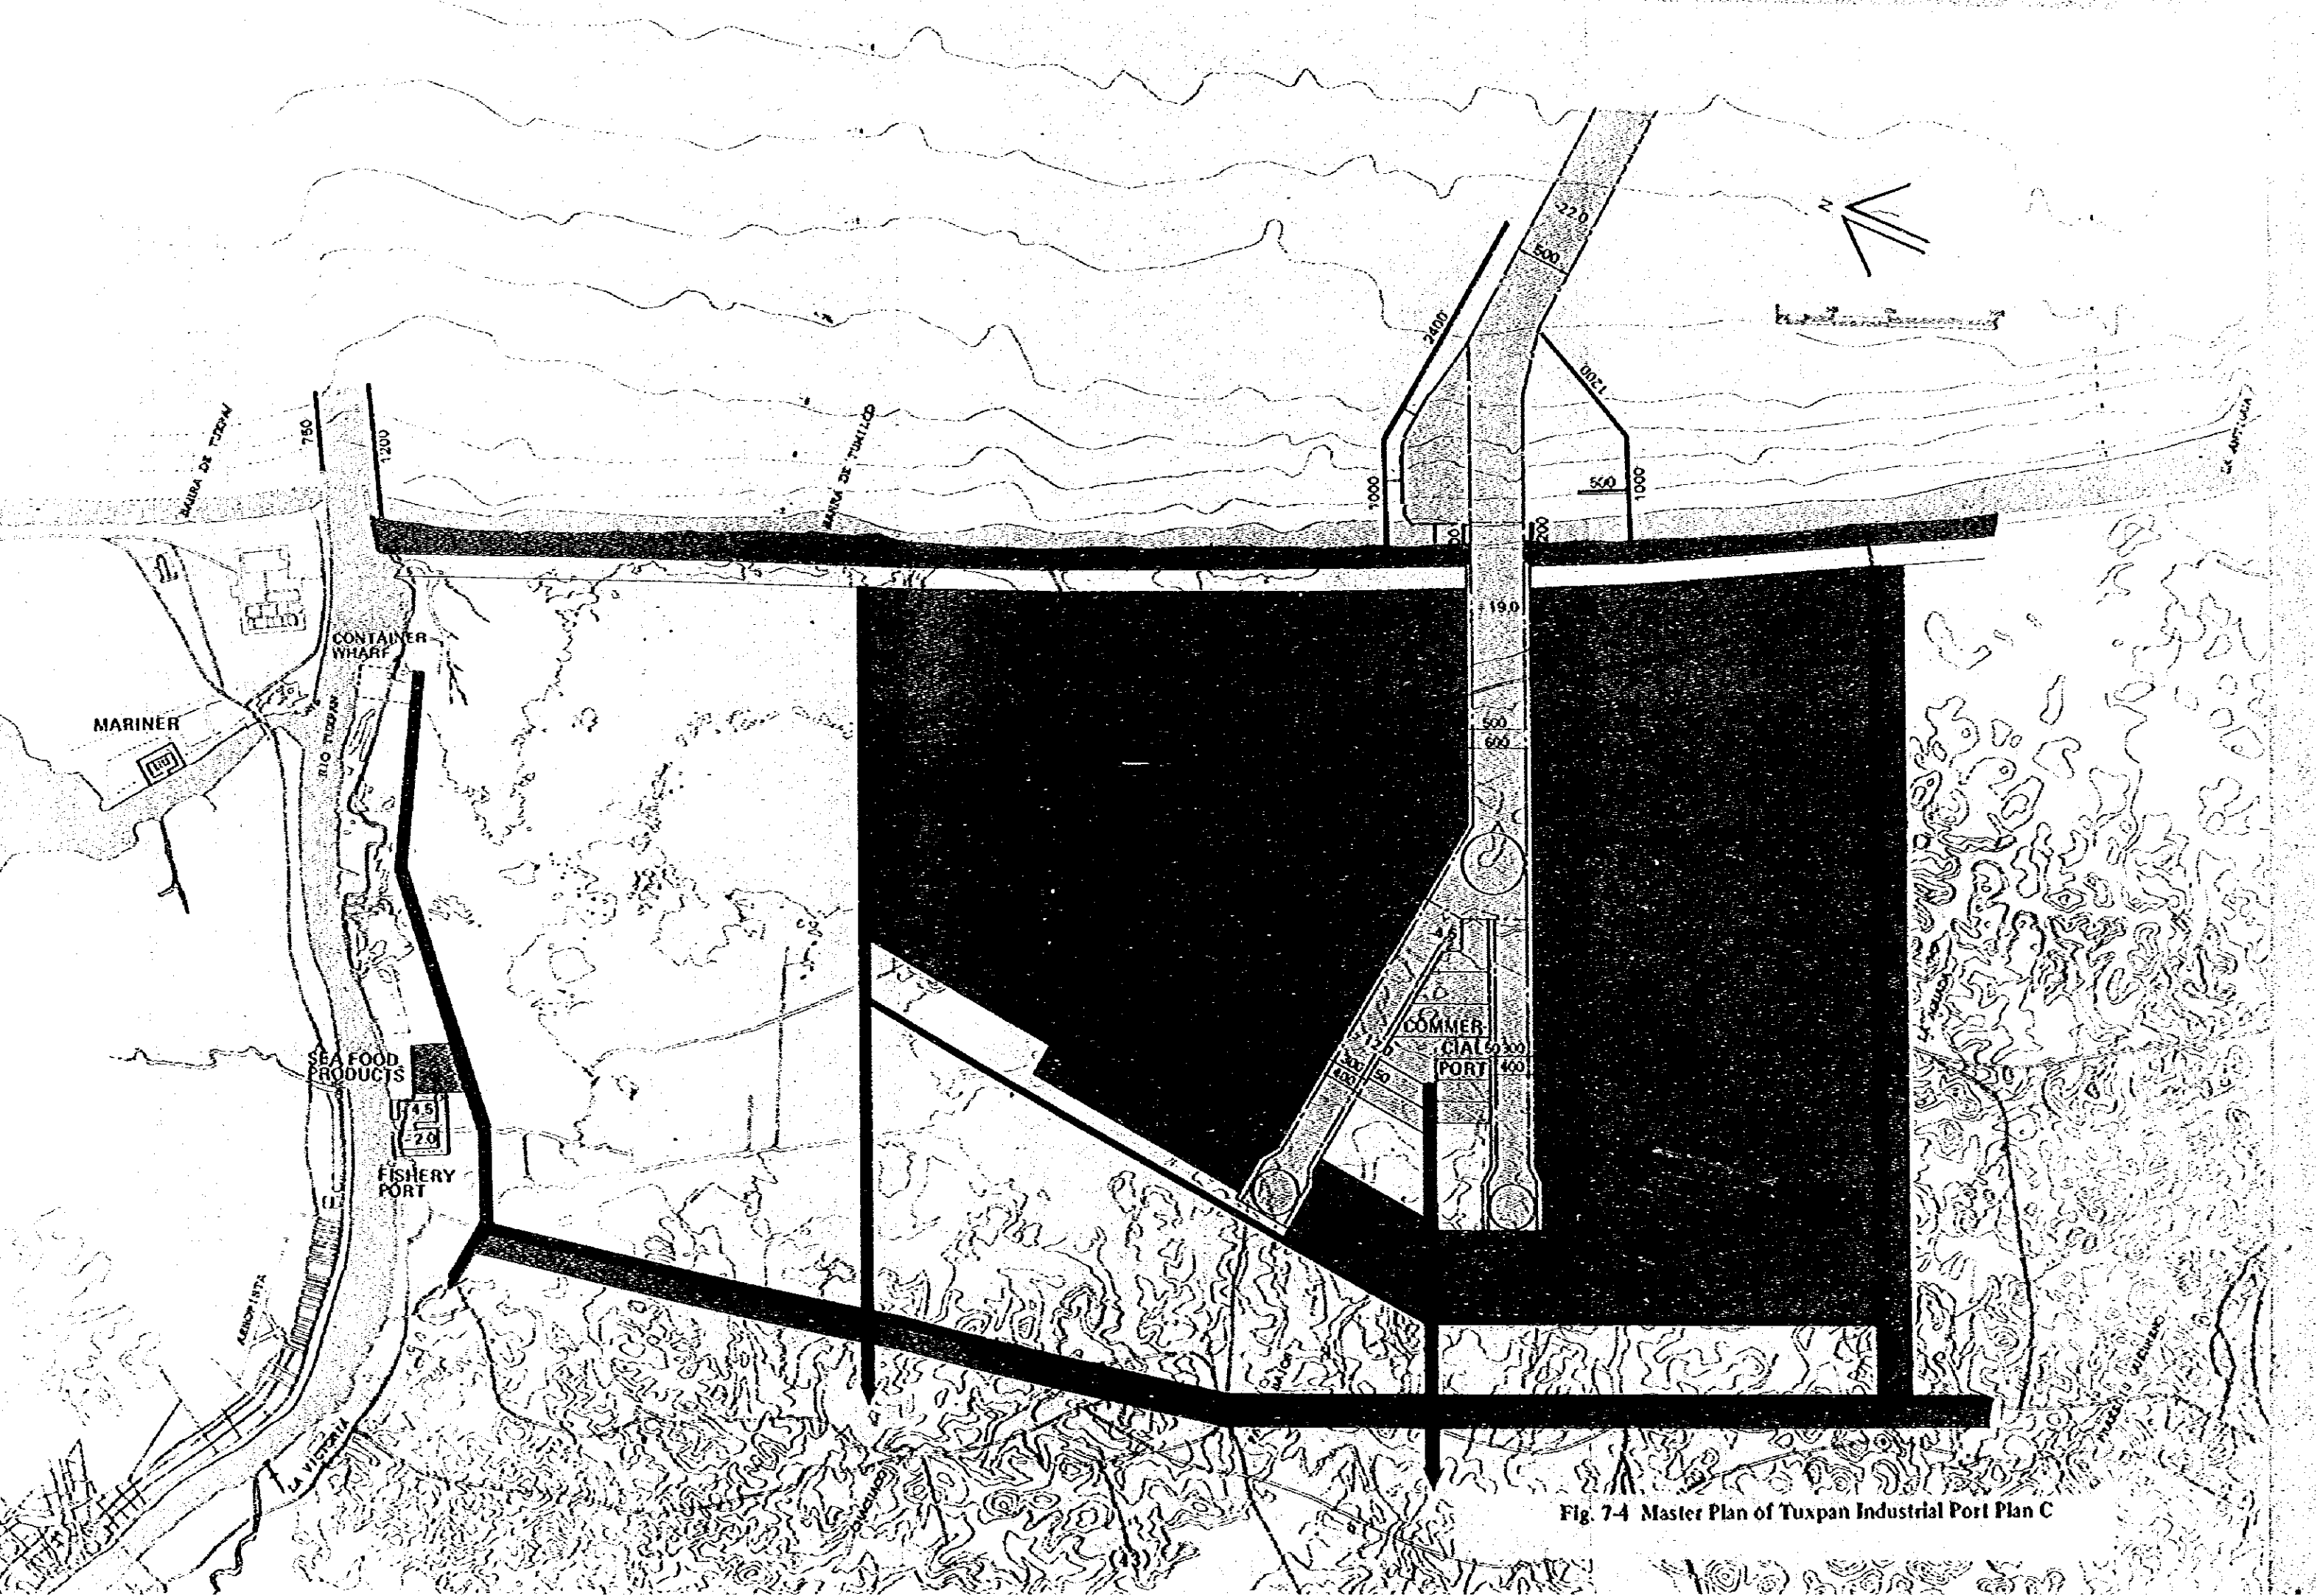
Master Plan of Tuxpan Industrial Port Plan C
